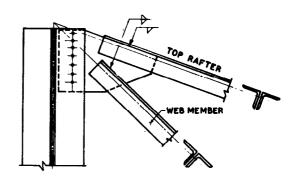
DETAIL R7 AT LEAN-TO ROOF END
